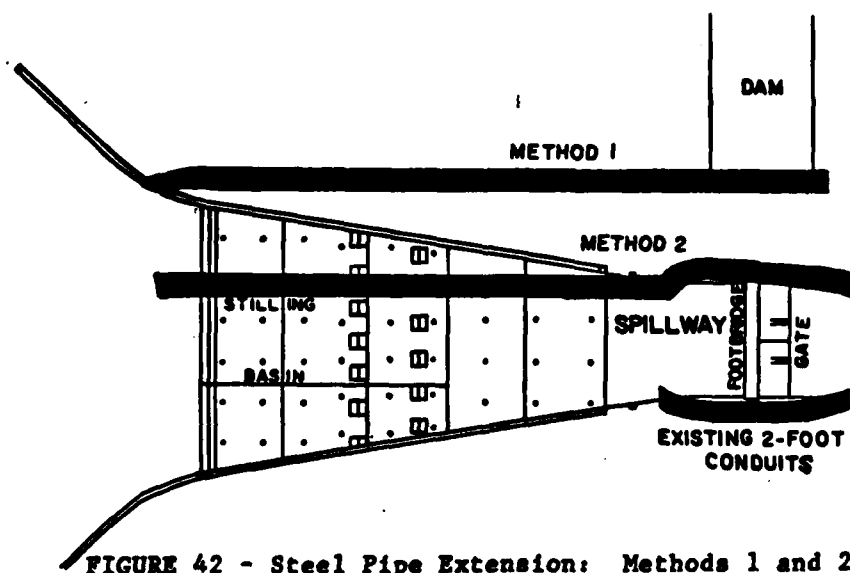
Steel Pipe Extension: Methods 1 and 2
